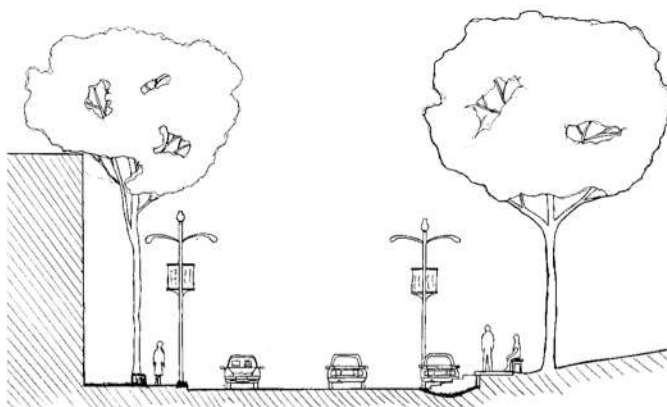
Proposed streetscape improvements on 117 near the Town Hall.
